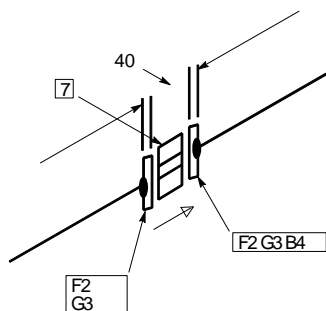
10. Bolt information for flanges enclosing wafer fittings
